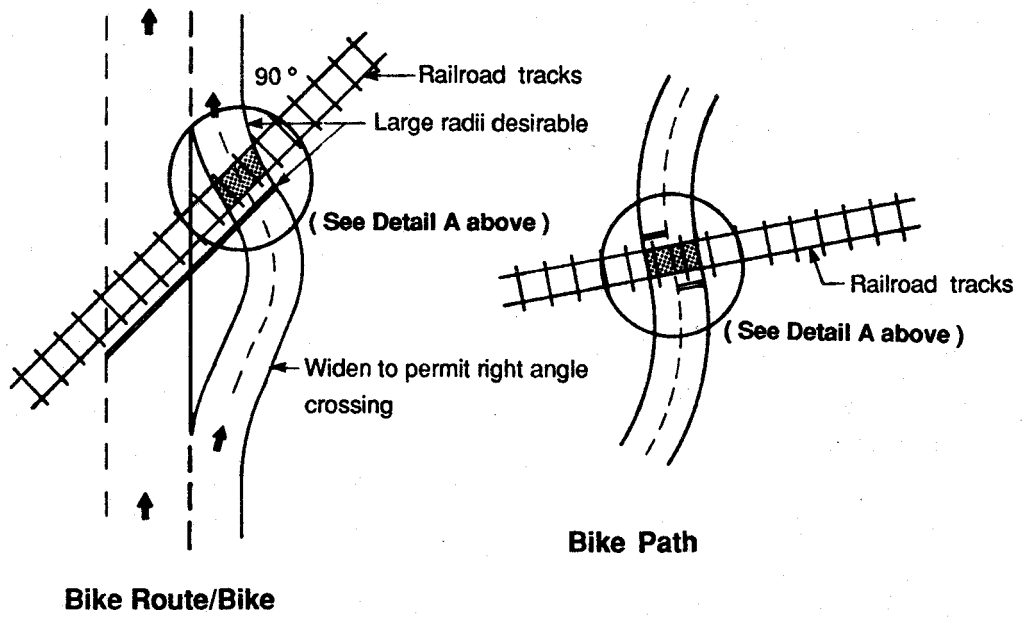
RAILWAY AND STREETCAR CROSSINGS
